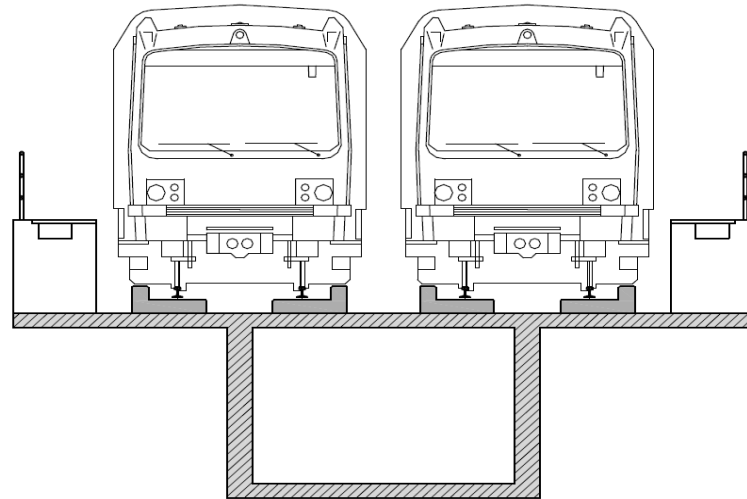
Cross-section superstructure with pre-cast box Girder Bridge
